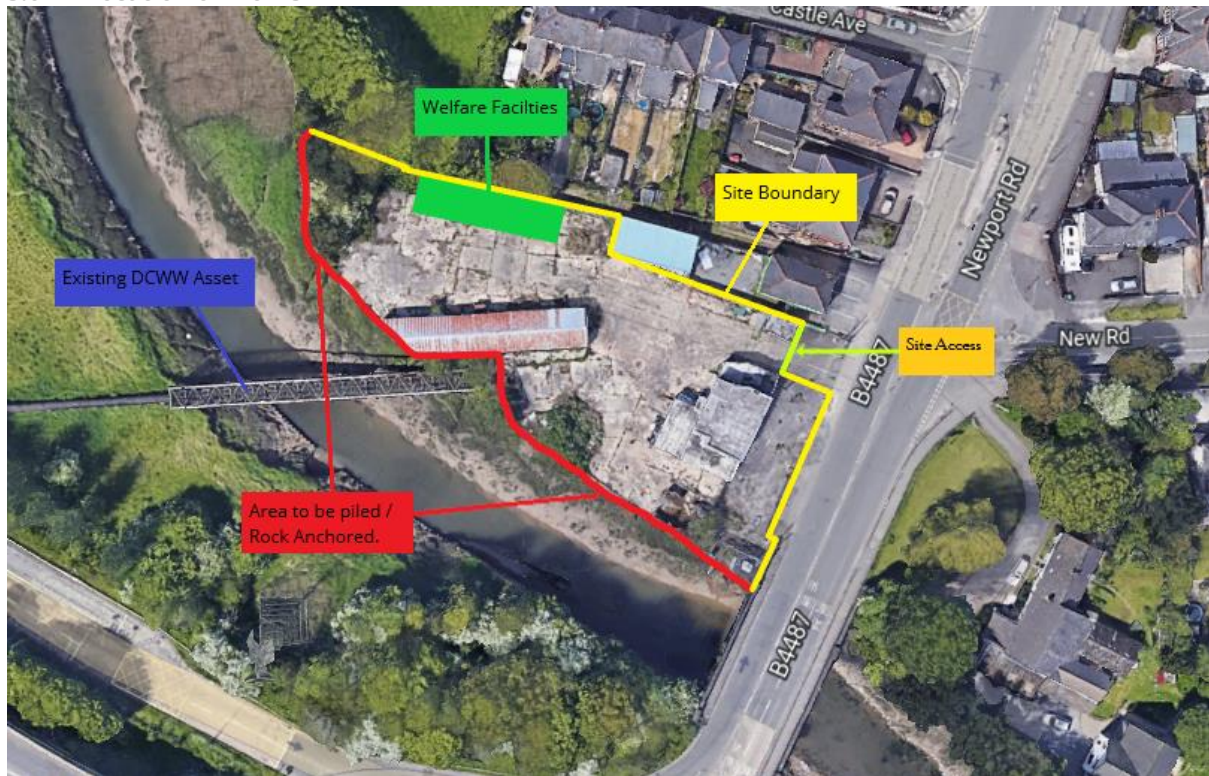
Overview of Site Location at Newport Road and Access to Site.
